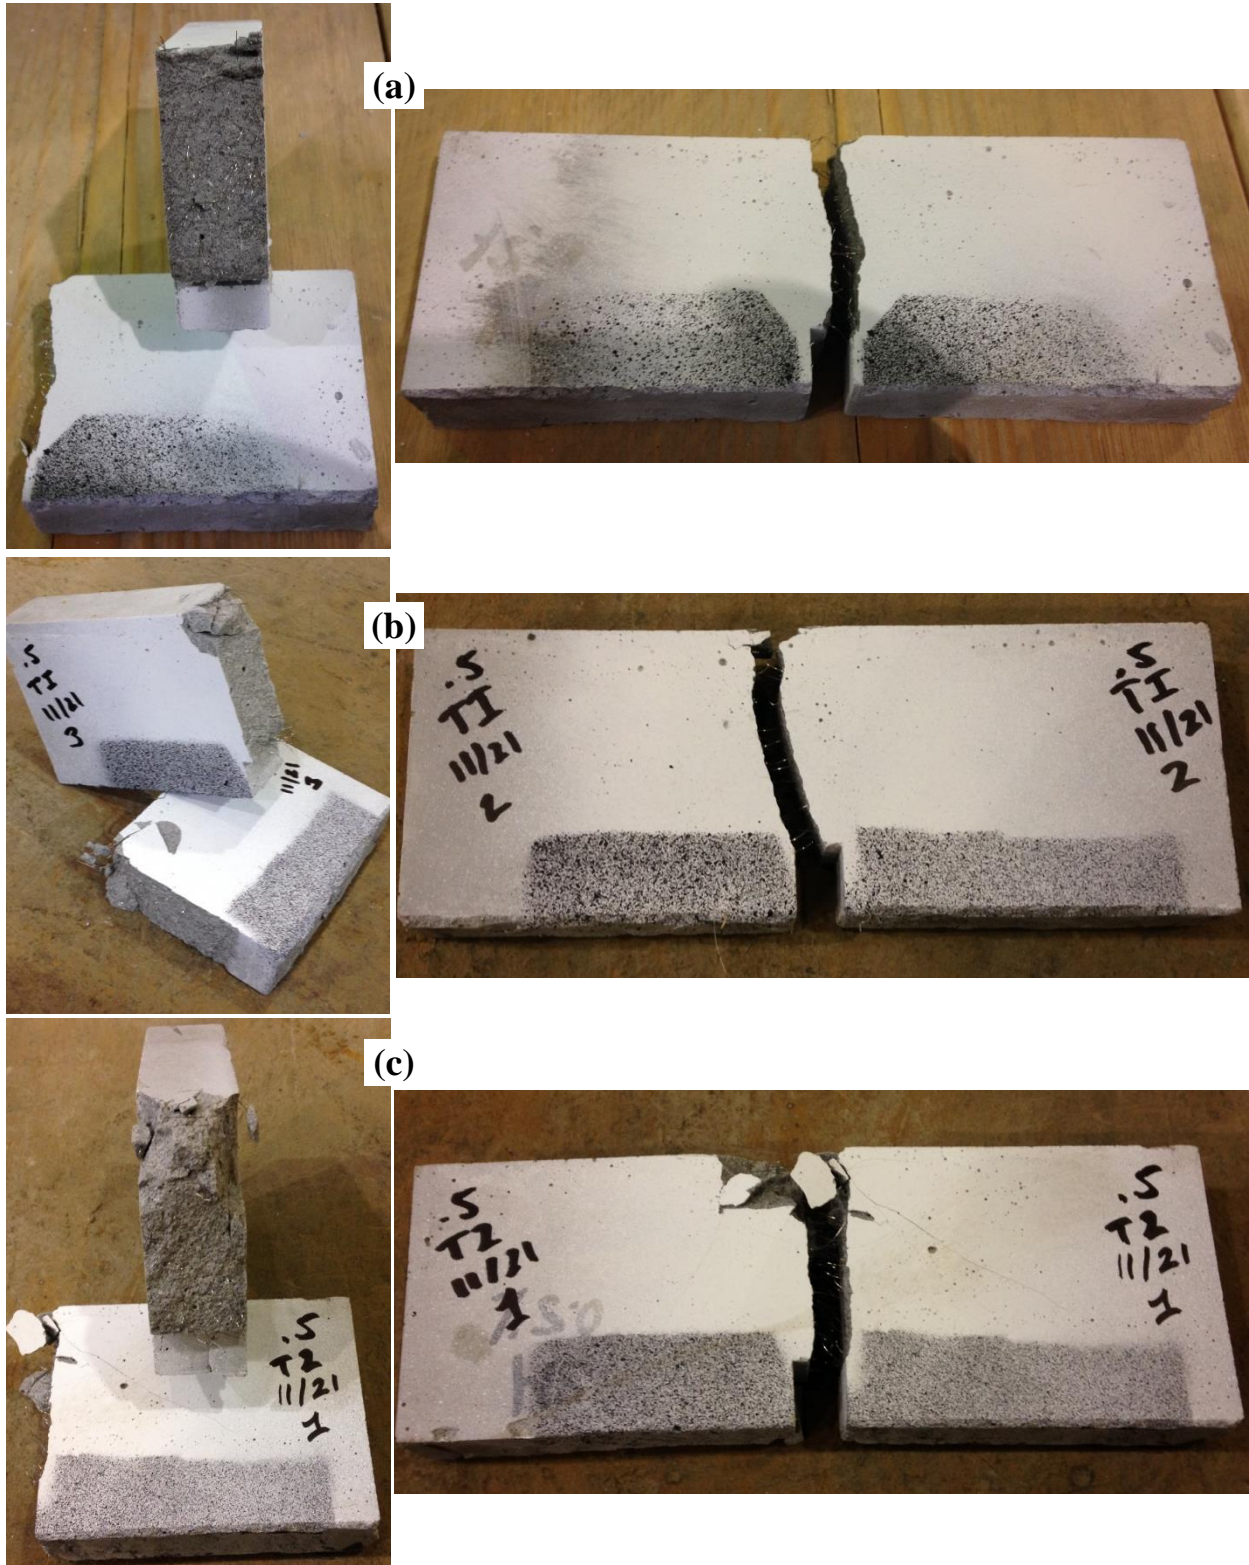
Examples of CS-0.5% specimens after testing: (a) 7.6 mm/sec (using the MTS machine); (b) Type 1 coupler (using M-SEFIM); (c) Type 2 coupler (using M-SEFIM)
